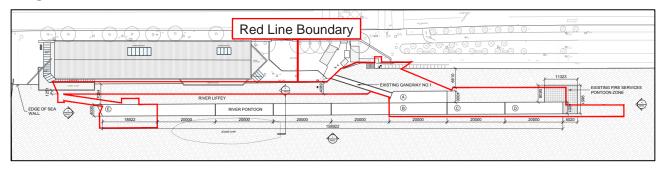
Existing Site Layout (Planning Report, Urban Agency)
